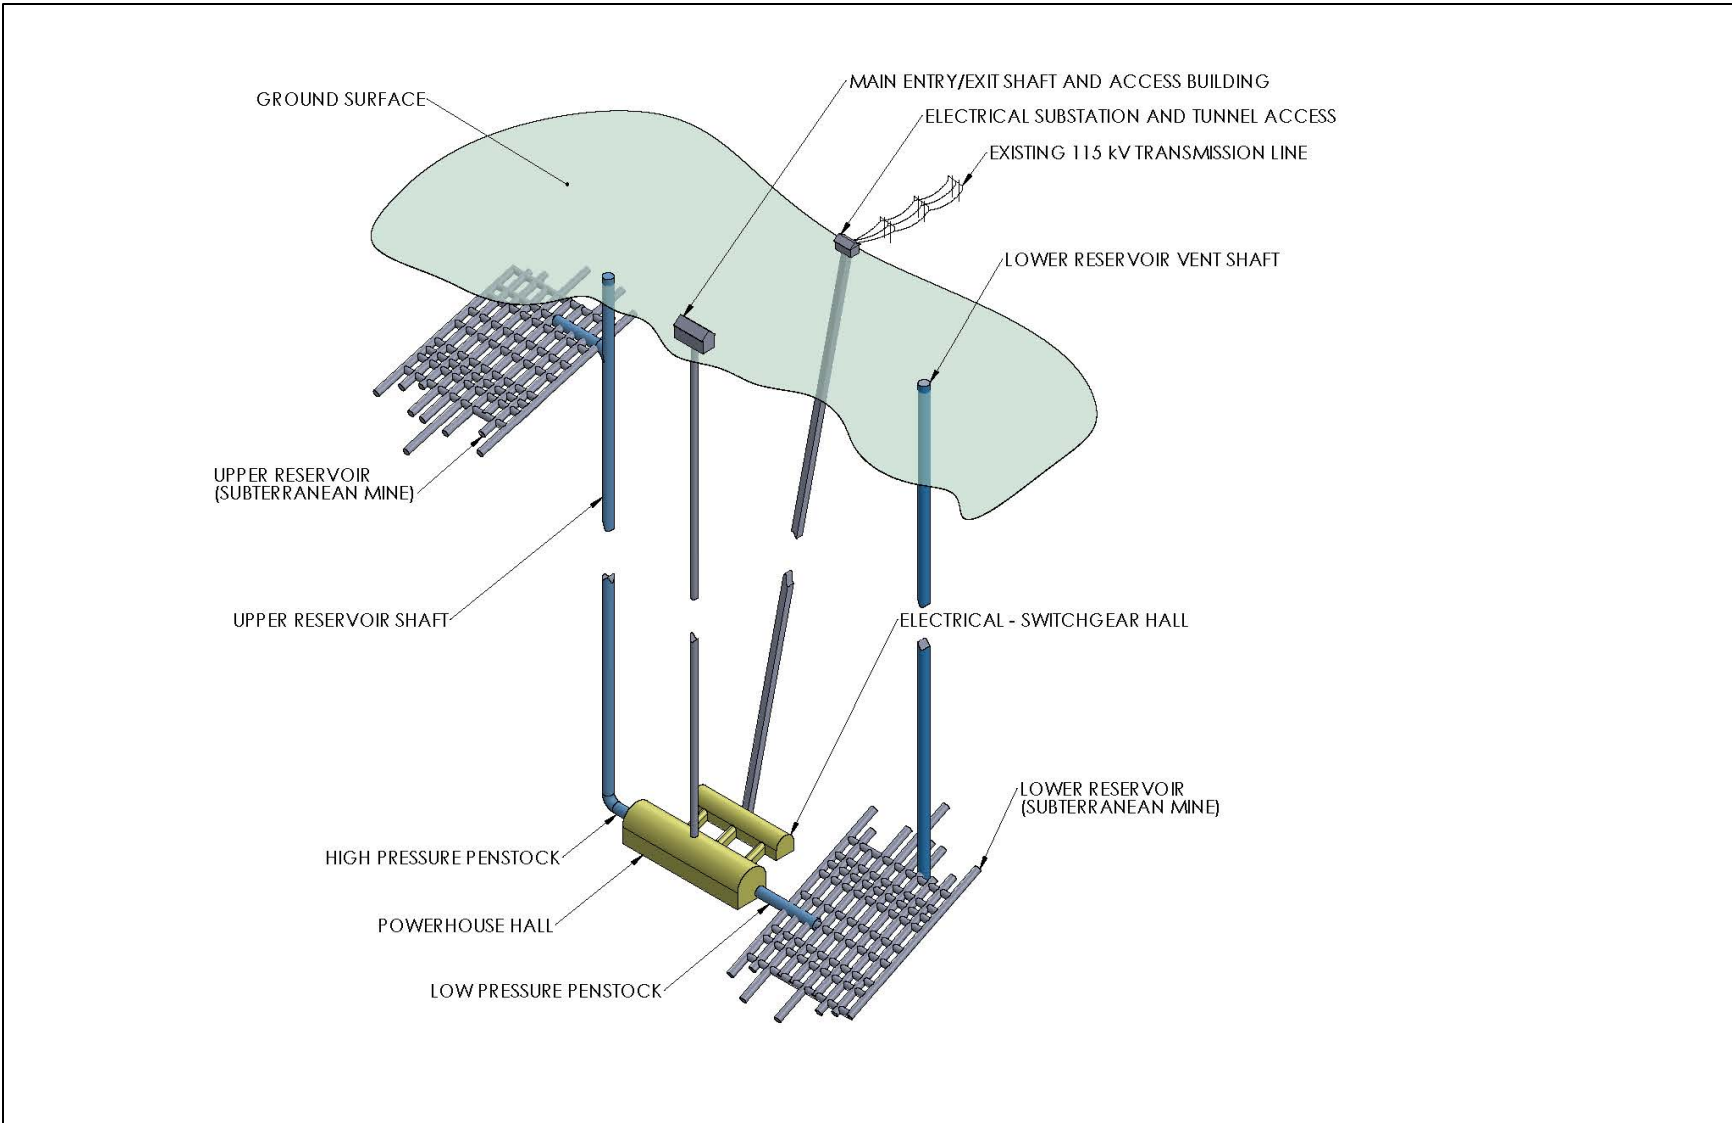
Conceptual drawing of the proposed facilities of the Mineville Project (Source: license application, as modified by staff).
